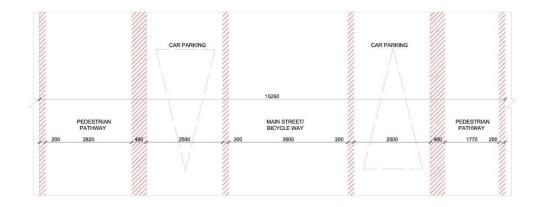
Street width and buffer spaces (in mm) for Gateway 13 in the area surrounding Hauptwache in Frankfurt am Main
